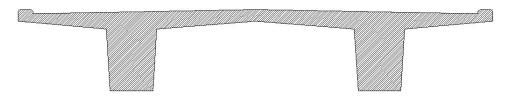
G(2) - TYPICAL DOUBLE T-BEAM CROSS SECTION
